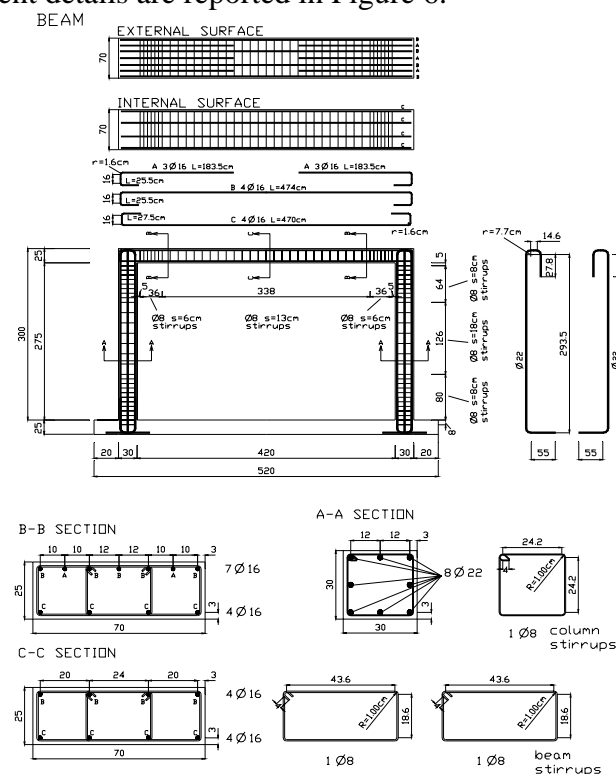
Reinforcement details of the tested frames (all dimensions are in cm)
